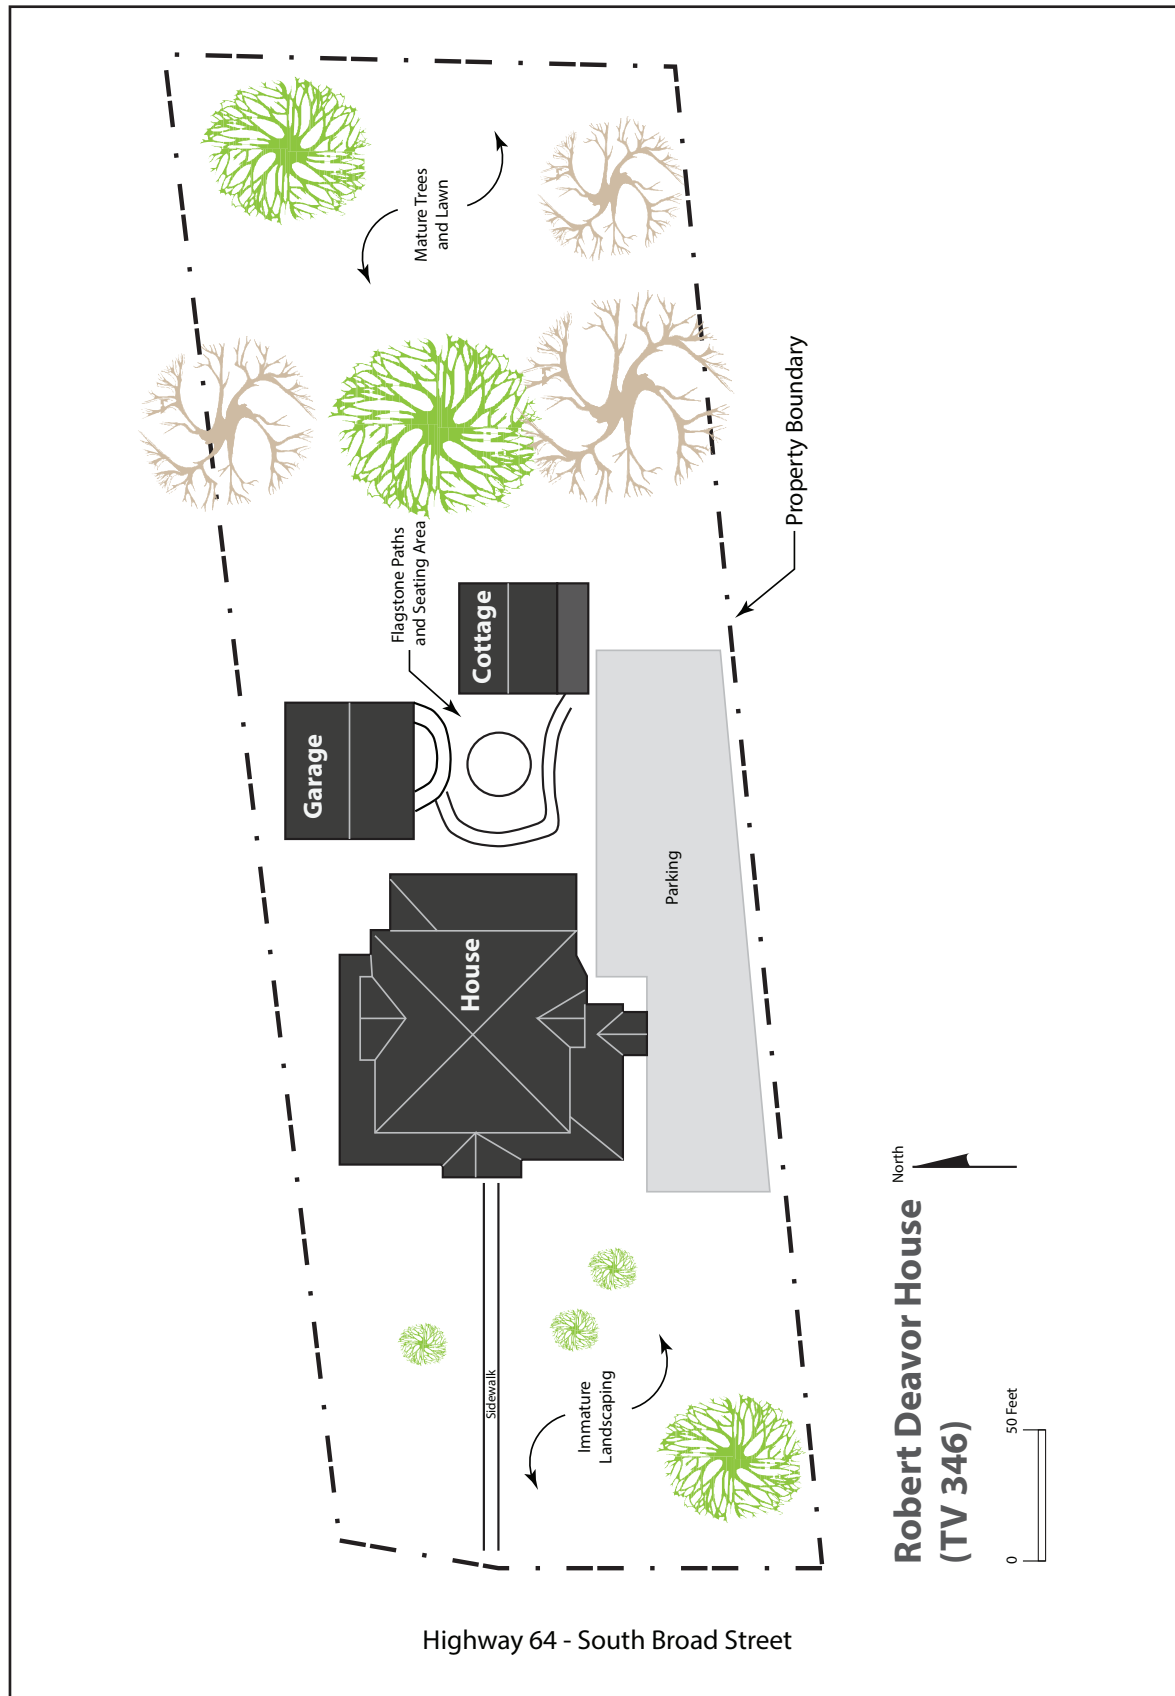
Site Plan of the Robert Deavor House (TV 346)
